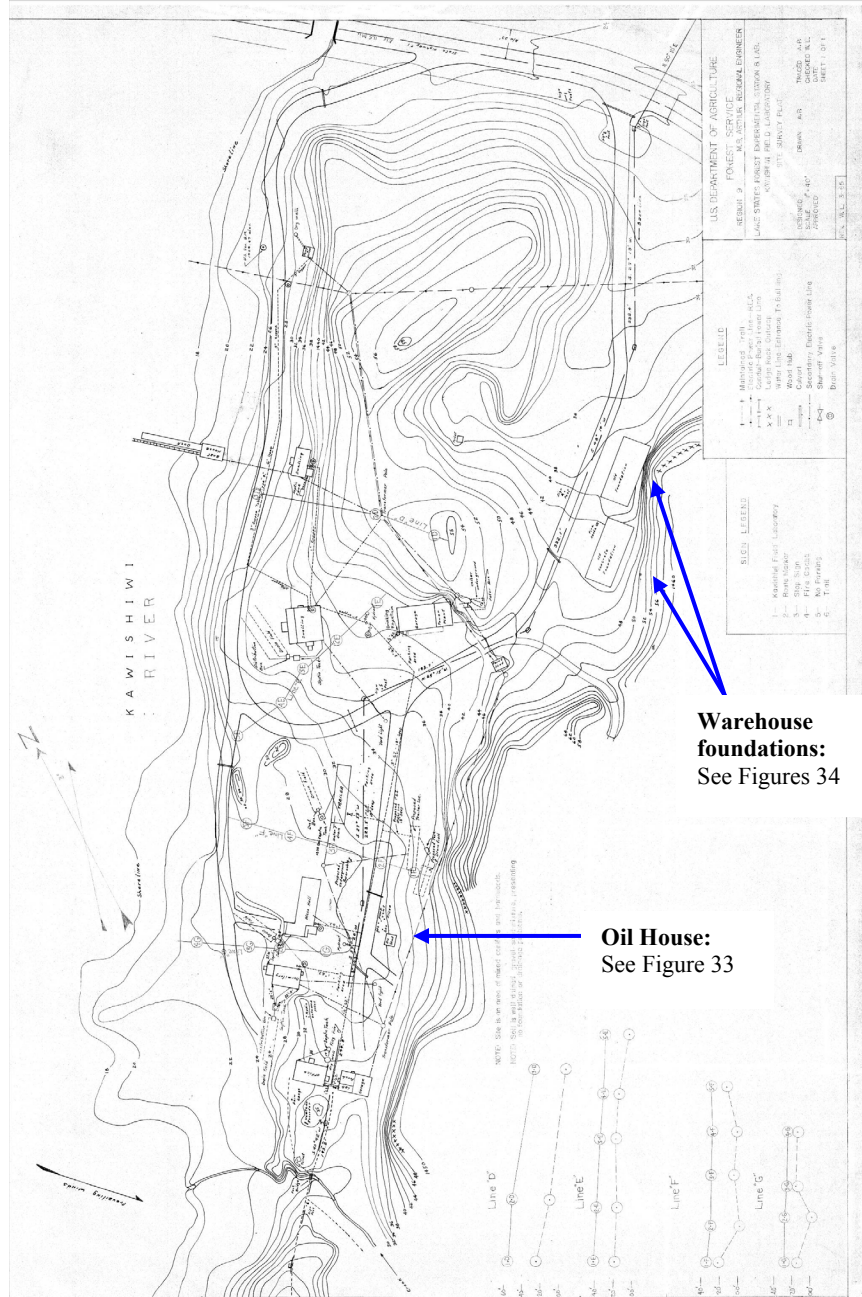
1937 site plan showing the locations of two warehouses and an oil house.
